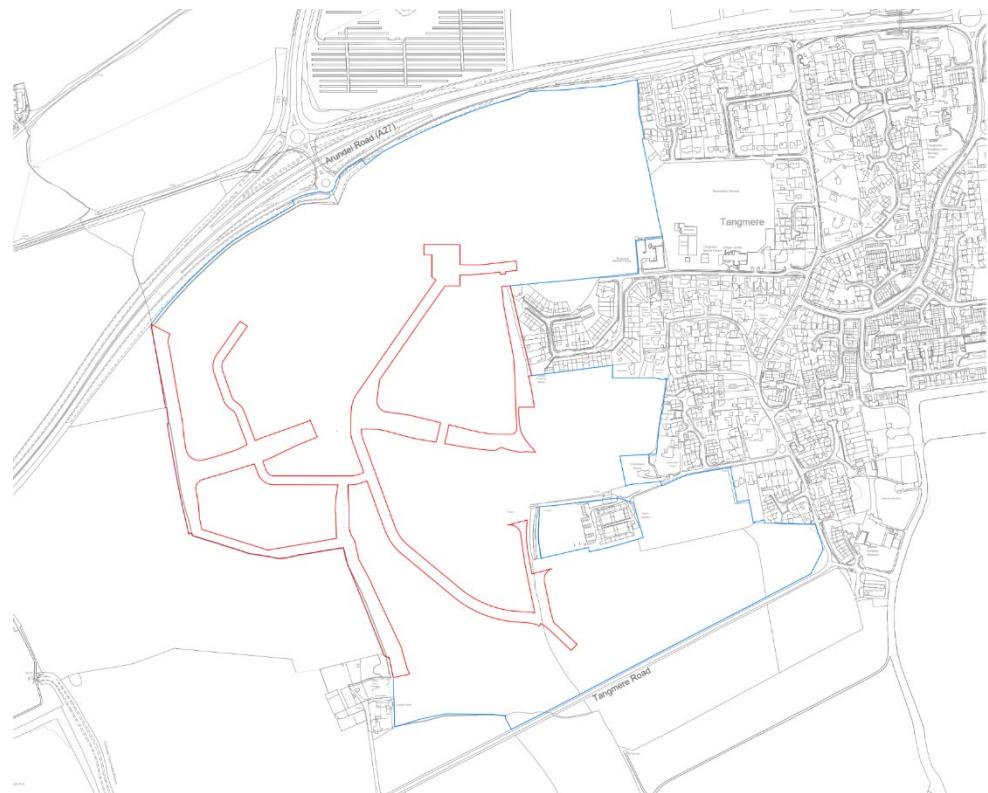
Extract of Site Location Plan 180620_TOR_001_C [not to scale]
